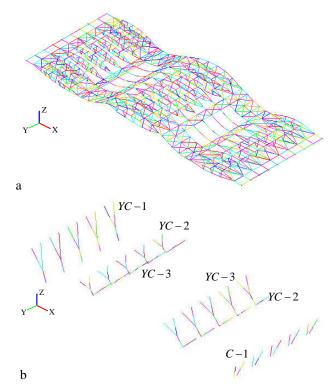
Three part of the terminal building 2 (a) steel roof; (b) Y-shaped column
